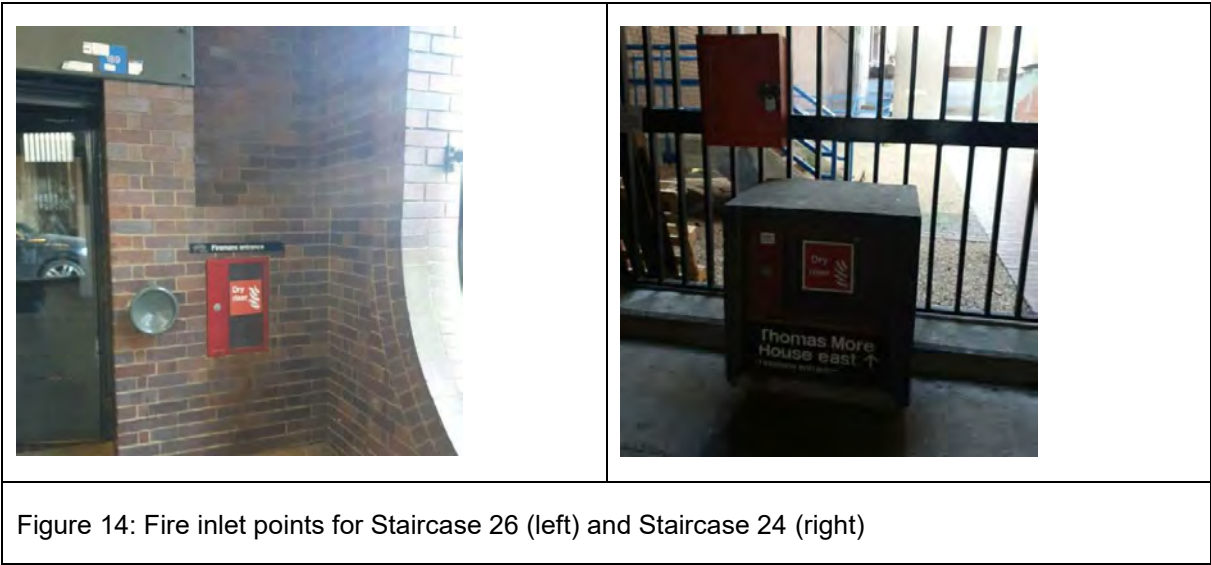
Fire inlet points for Staircase 26 (left) and Staircase 24 (right)
